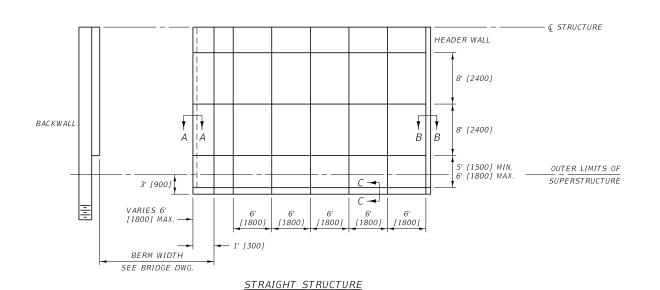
DETAILED DRAWING REFERENCE DWG. NO. 613-06
